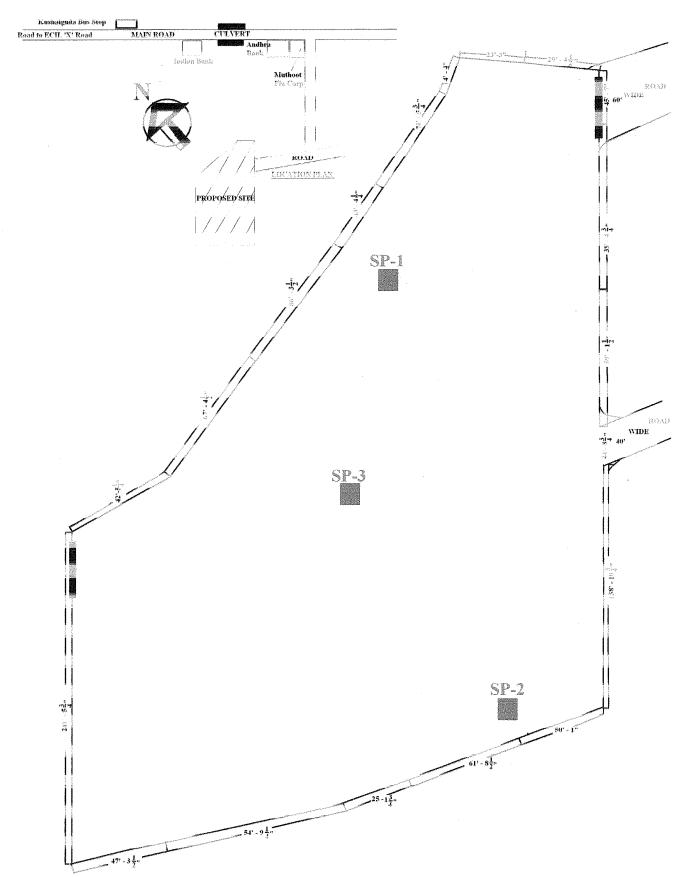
SITE PLAN OF THE PROPOSED CLUB HOUSE & APARTMENT BLOCK SITUATED AT NAGARAM VILLAGE & MANDAL, HYDERABAD.
